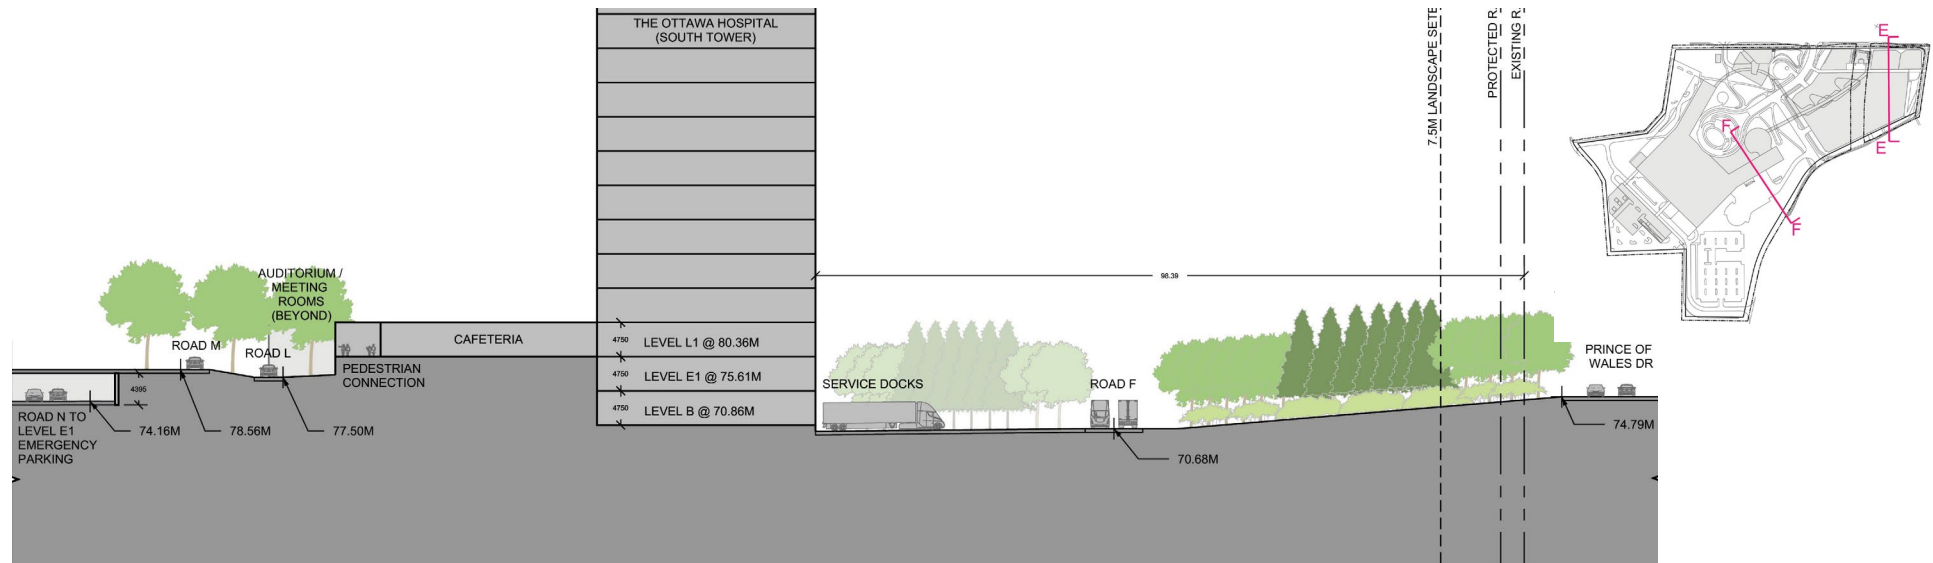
Section F Looking East at Prince of Wales Drive and Hospital Service Docks
